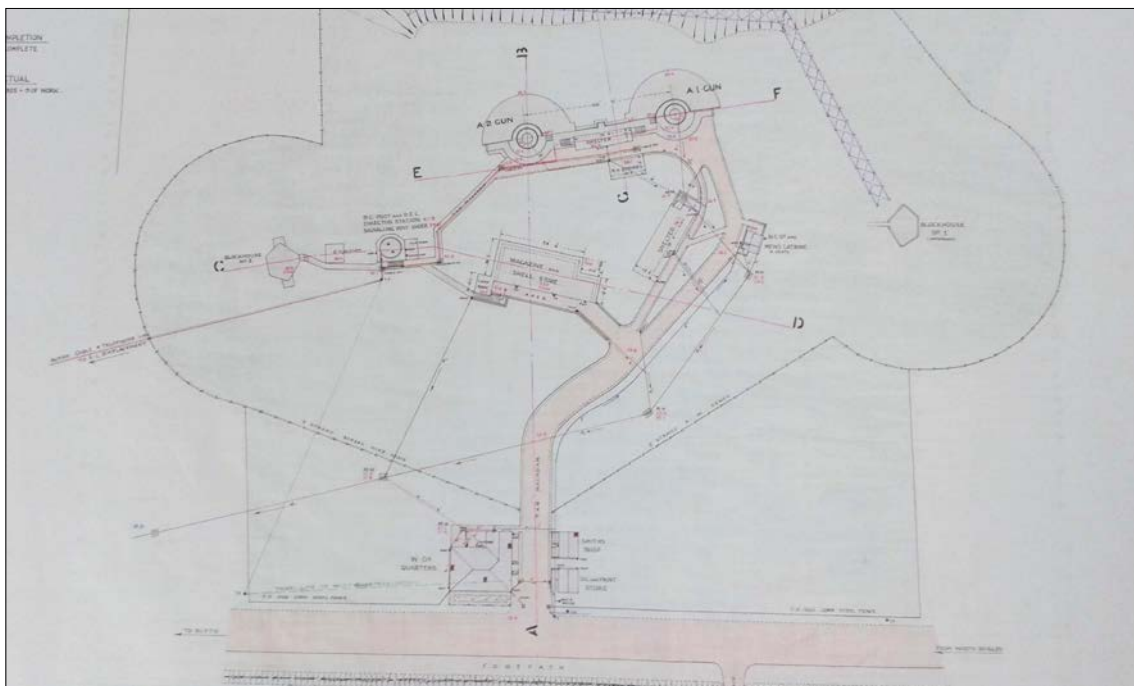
Plan of Blyth Battery, 1922 (TNA – WO 78/4969)
